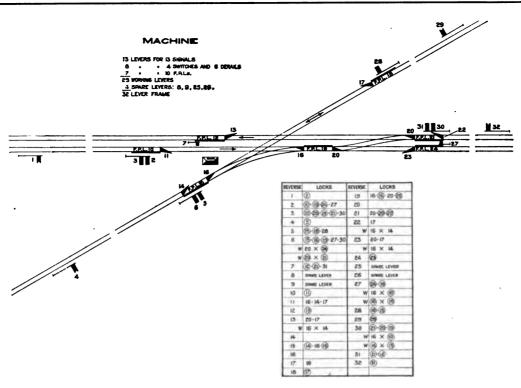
Typical Interlocking Plan and Locking Sheet; Single Track (with Turnout)
